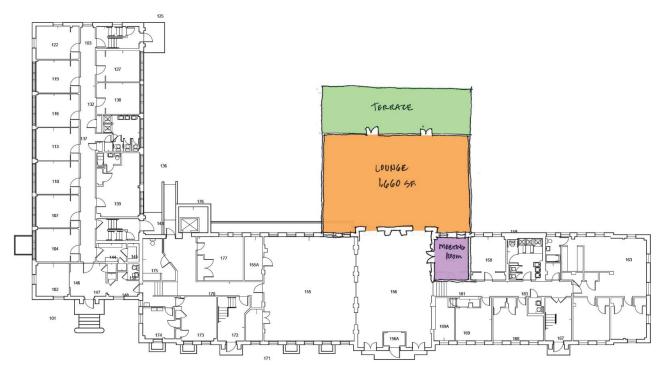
Fairfield Hall Proposed Concept Floor Plan
